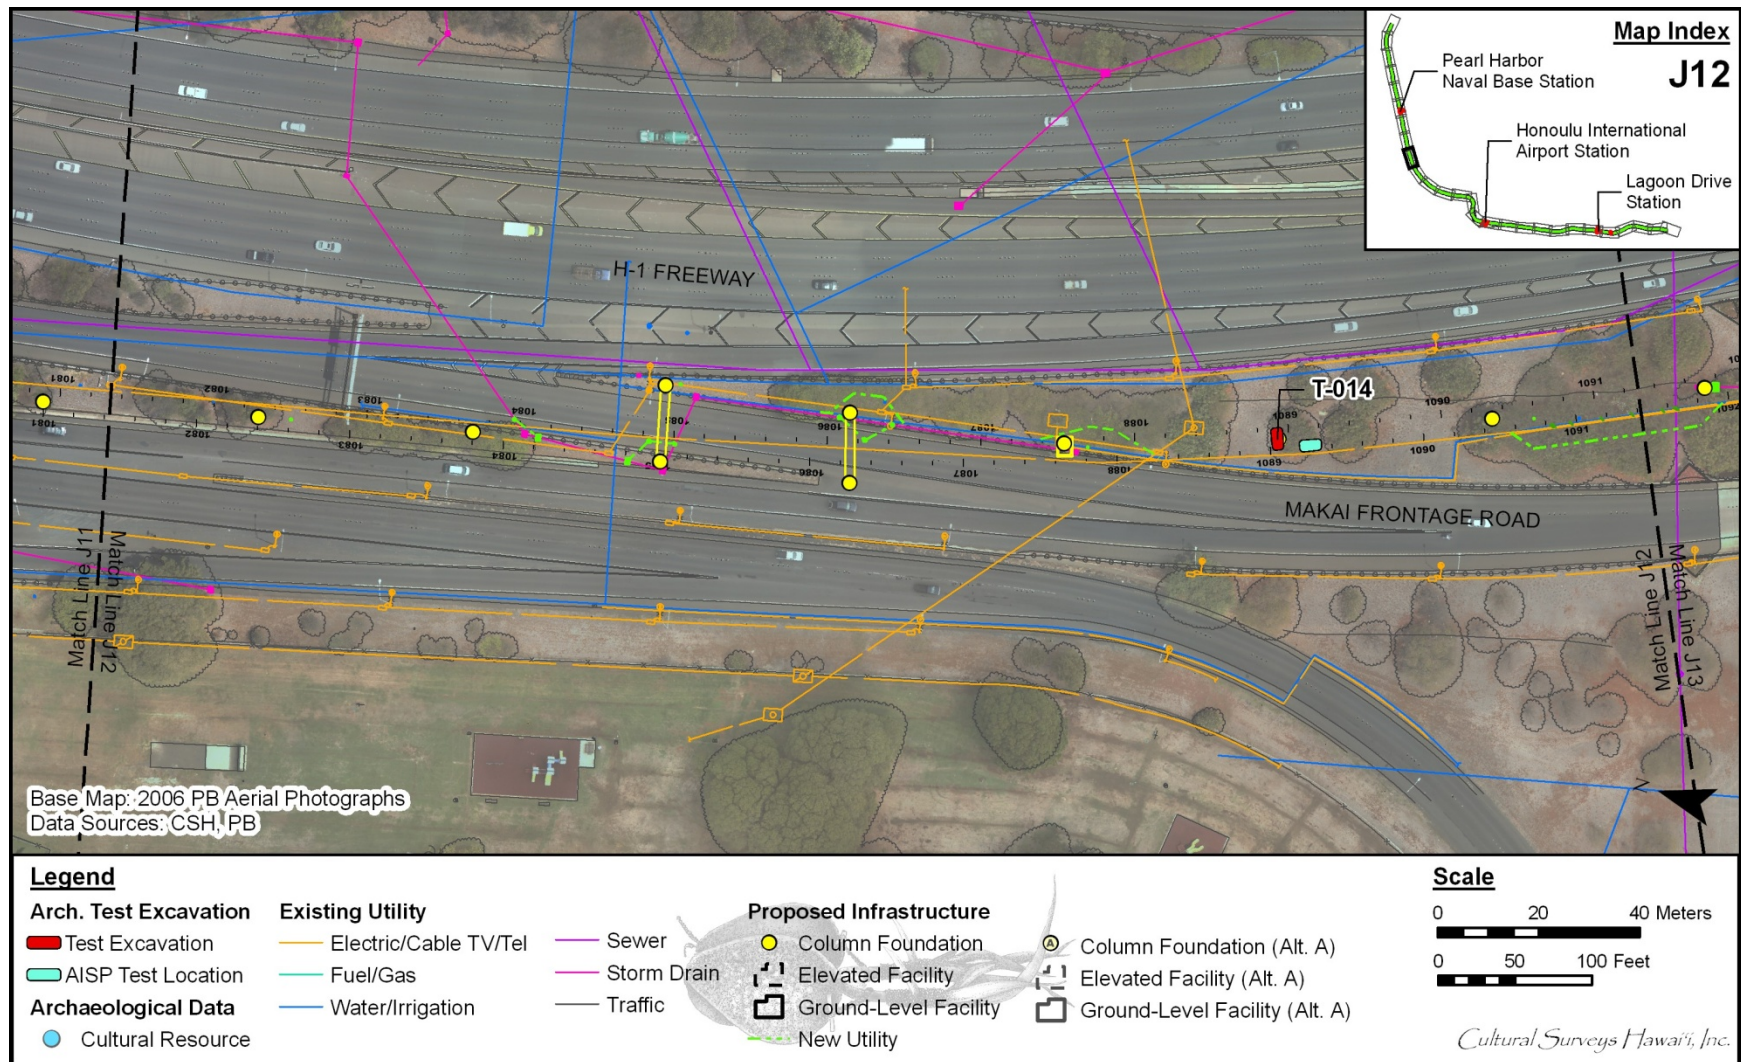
Map Sheet J12, one test excavation (T-014) at column foundation @ 1077+80
